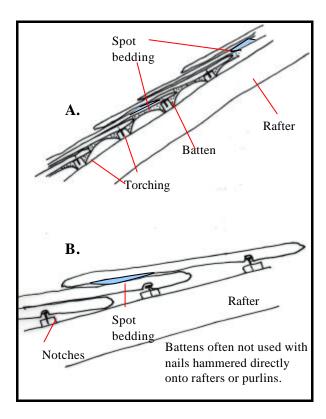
Diagram showing methods of attaching/hanging stone slate. A: Stone slates attached with nails through holes at head of slate. B: Thick stone slates (flags) hung from notches on underside of slates unpointed.
